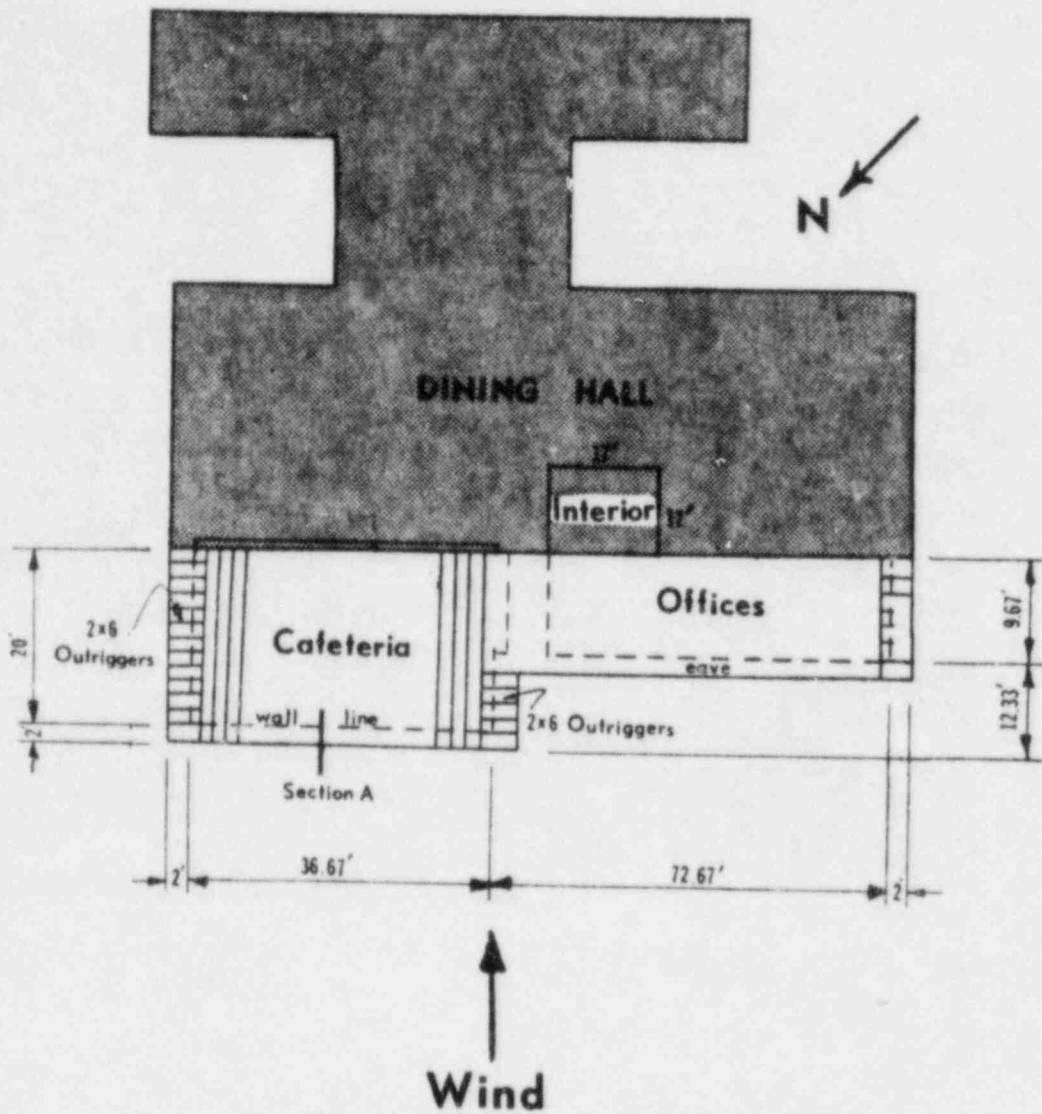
ROOF PLAN OF DINING HALL (damage to roof is unshaded).
